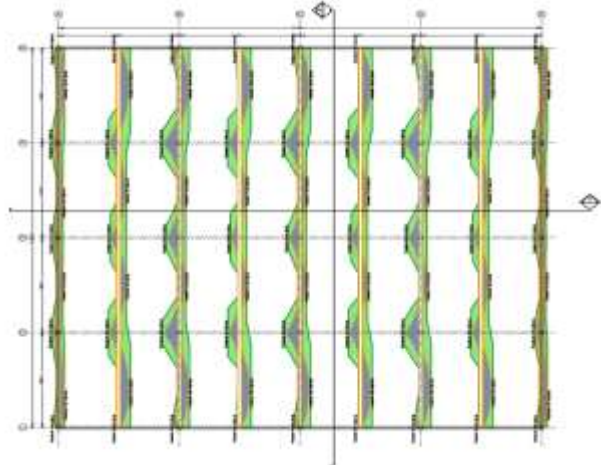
Reinforcement profile B for Conventional Slab 9x9m.
